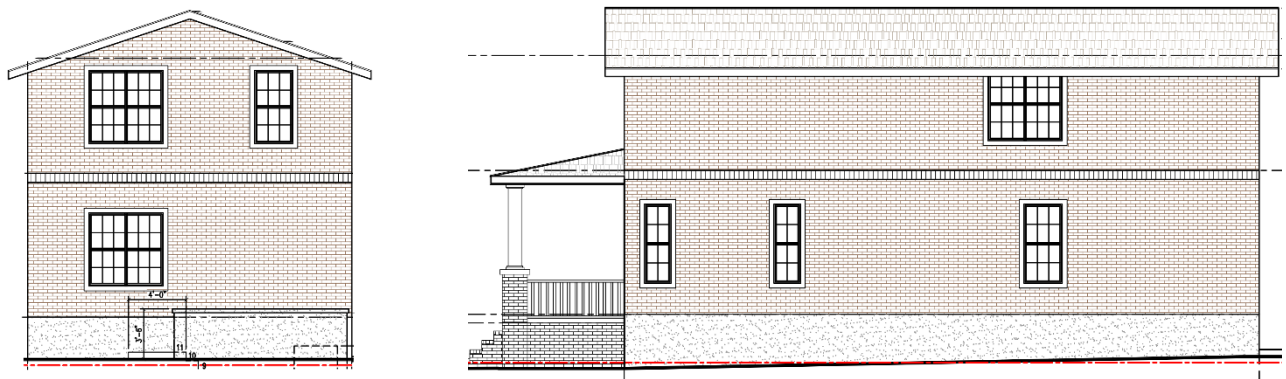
Rear (left) and East (right) Elevations of Proposed Dwelling
